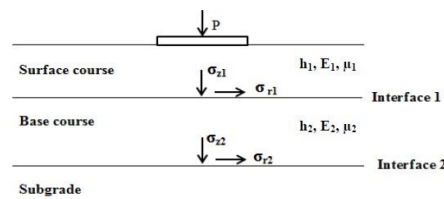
Failure modes and Critical strains for flexible pavement (Source: Lekha, 2016)
